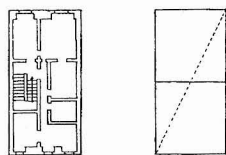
Plan of a two-window façade width building: double square: 177 Correiros Street. (Drawing by Jorge Mascarenhas).
